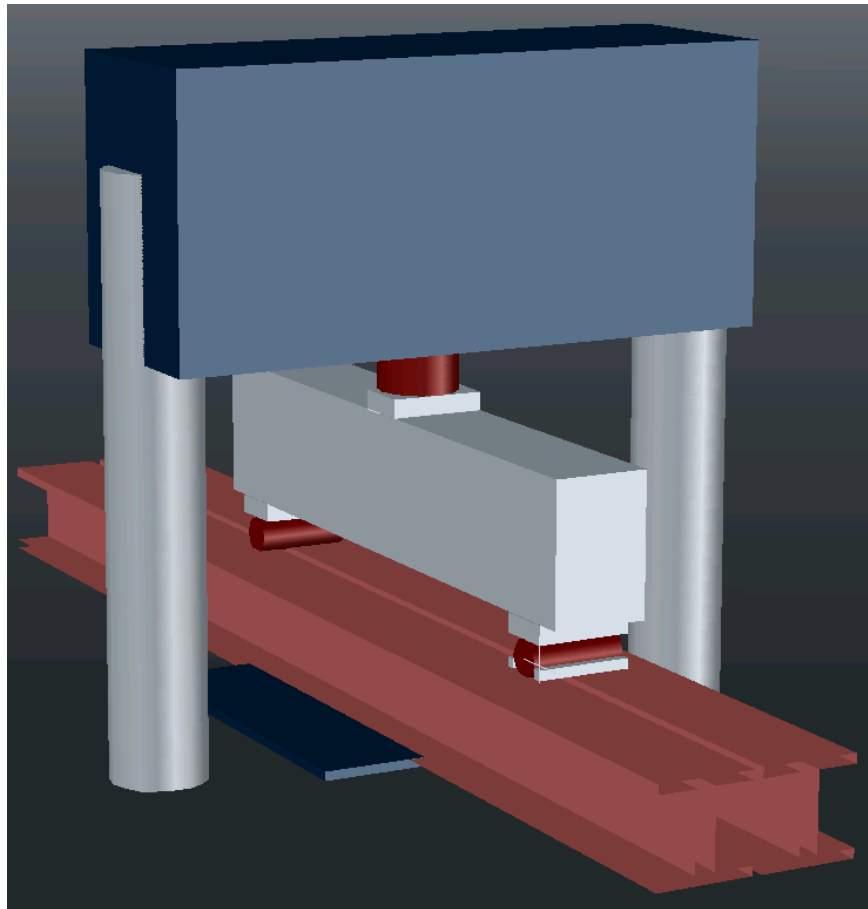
Typical test setup for Steel Joists Encased in Concrete Beams
